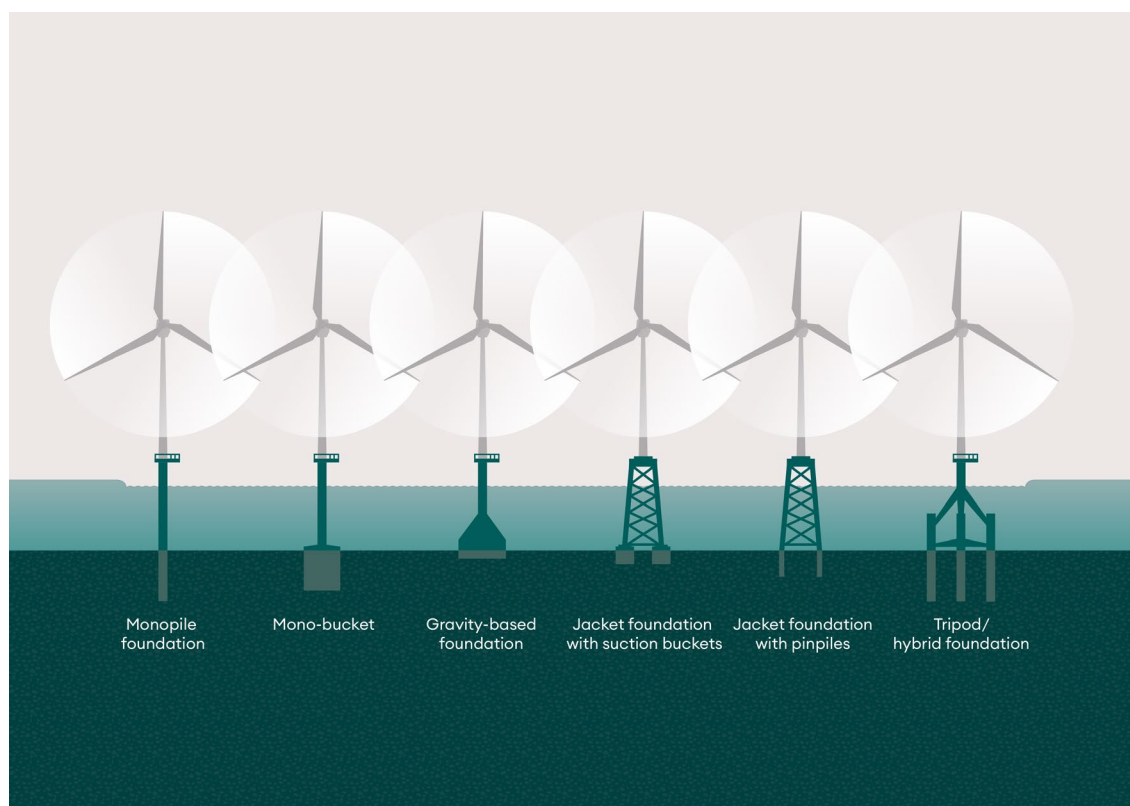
Foundations from left: Monopile, monopile with suction buckets, gravity-based foundation, jacket with suction buckets, jacket with pin piles and tripod foundation with pin piles. [Illustration: OX2 AB 2023].
